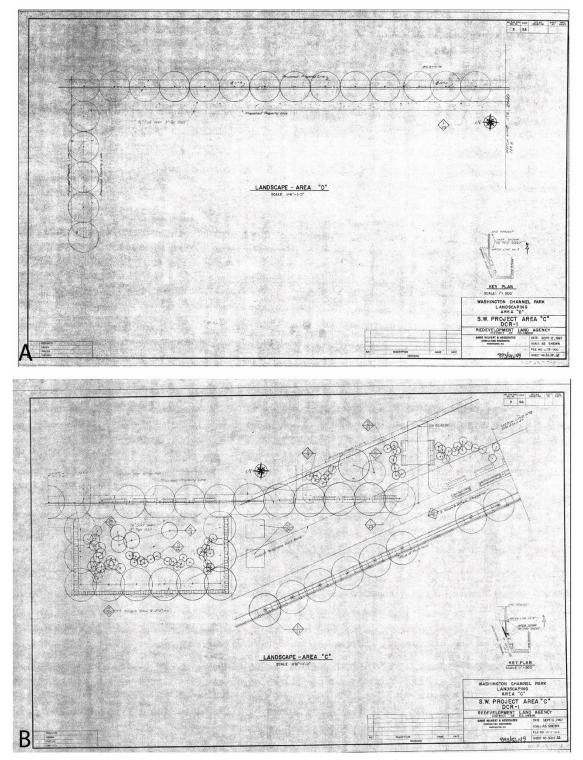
b: The 1967-1968 planting plan features a simple planting plan in keeping with Modernist landscape principles. (A) The 6<sup>th</sup> Street walkway on the north end of the cultural landscape; (B) The north play area and surrounding landscape rooms. ("Park Improvement Plan," TIC 823/80029, Sheet 5, NCA)
